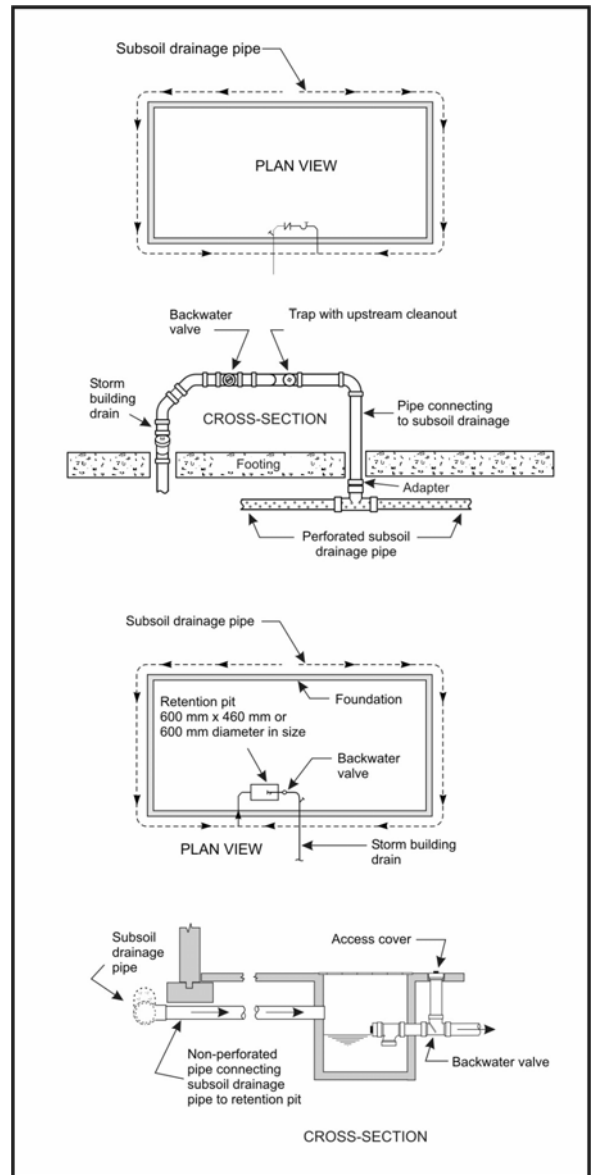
(1) Subsoil Drainage Connection.”;
